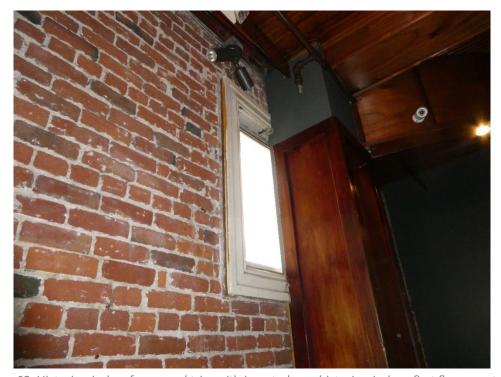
Historic window frame and trim with inserted non-historic window, first floor, west wall.
